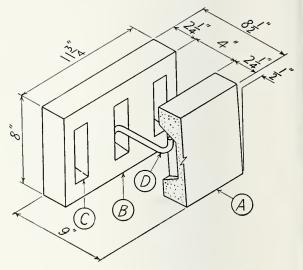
"Dun-Ti-Stone" concrete unit. A, facing slab; B, backing slab; C, recess; D, tie bar.
